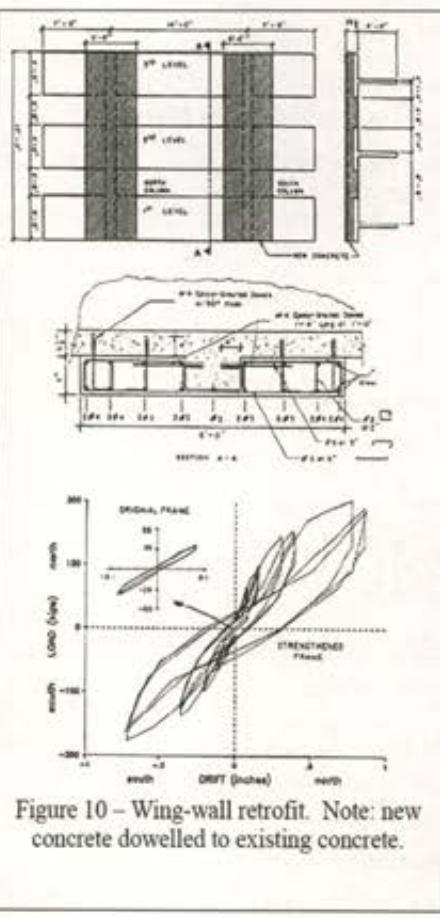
Wing-wall retrofit. Note: new concrete dowelled to existing concrete.
